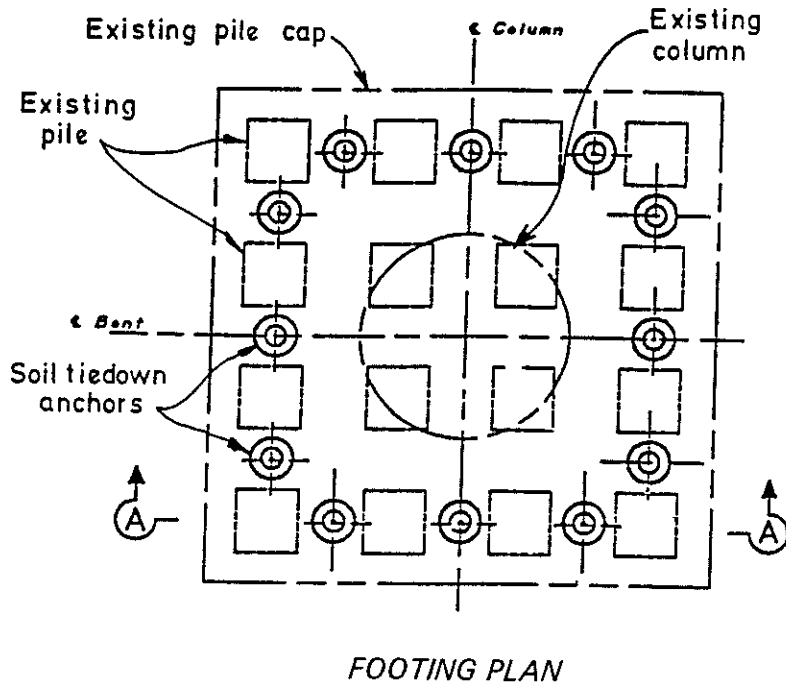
Foundation strengthening using soil tension anchors (Caltrans 1992).
